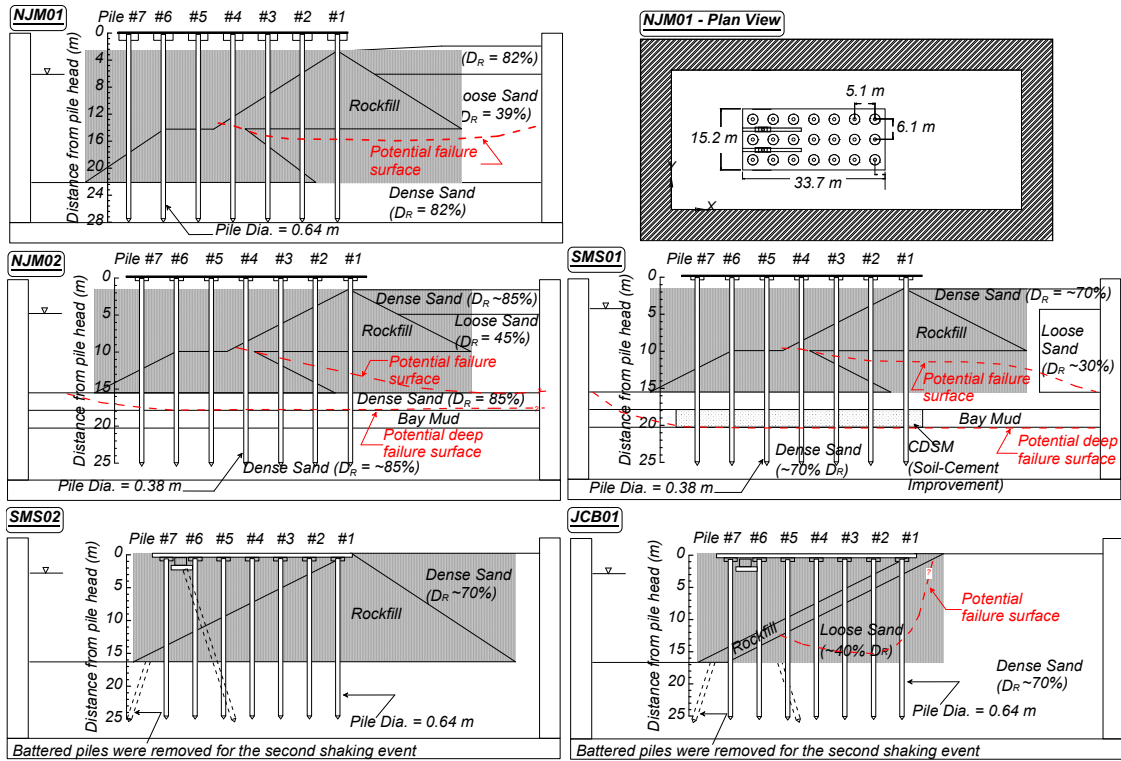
Cross sections and plan view of five centrifuge tests on pile-supported wharves.
